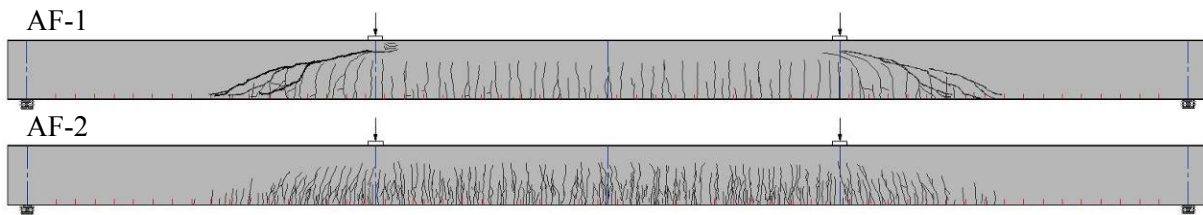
Cracking pattern of the full scale beams AF-1 and AF-2
